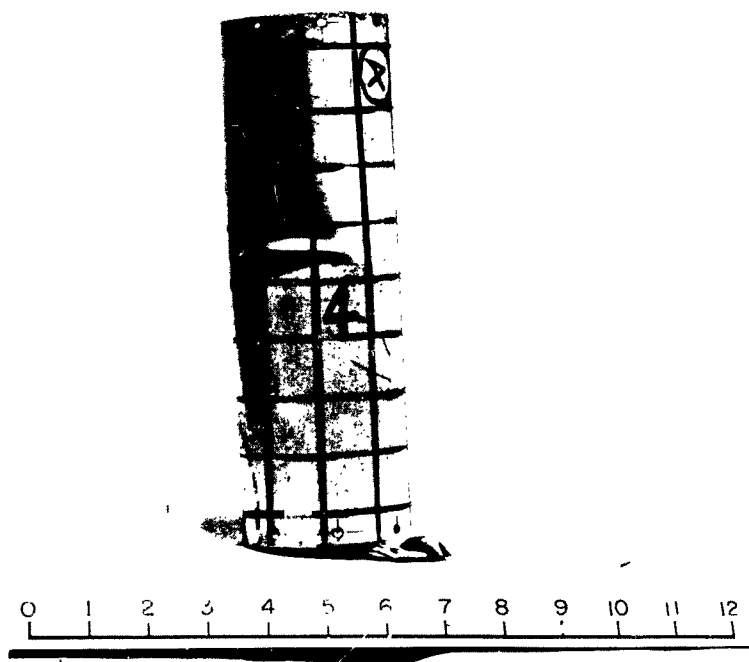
SHELL NO. 5 - FRONT VIEW
